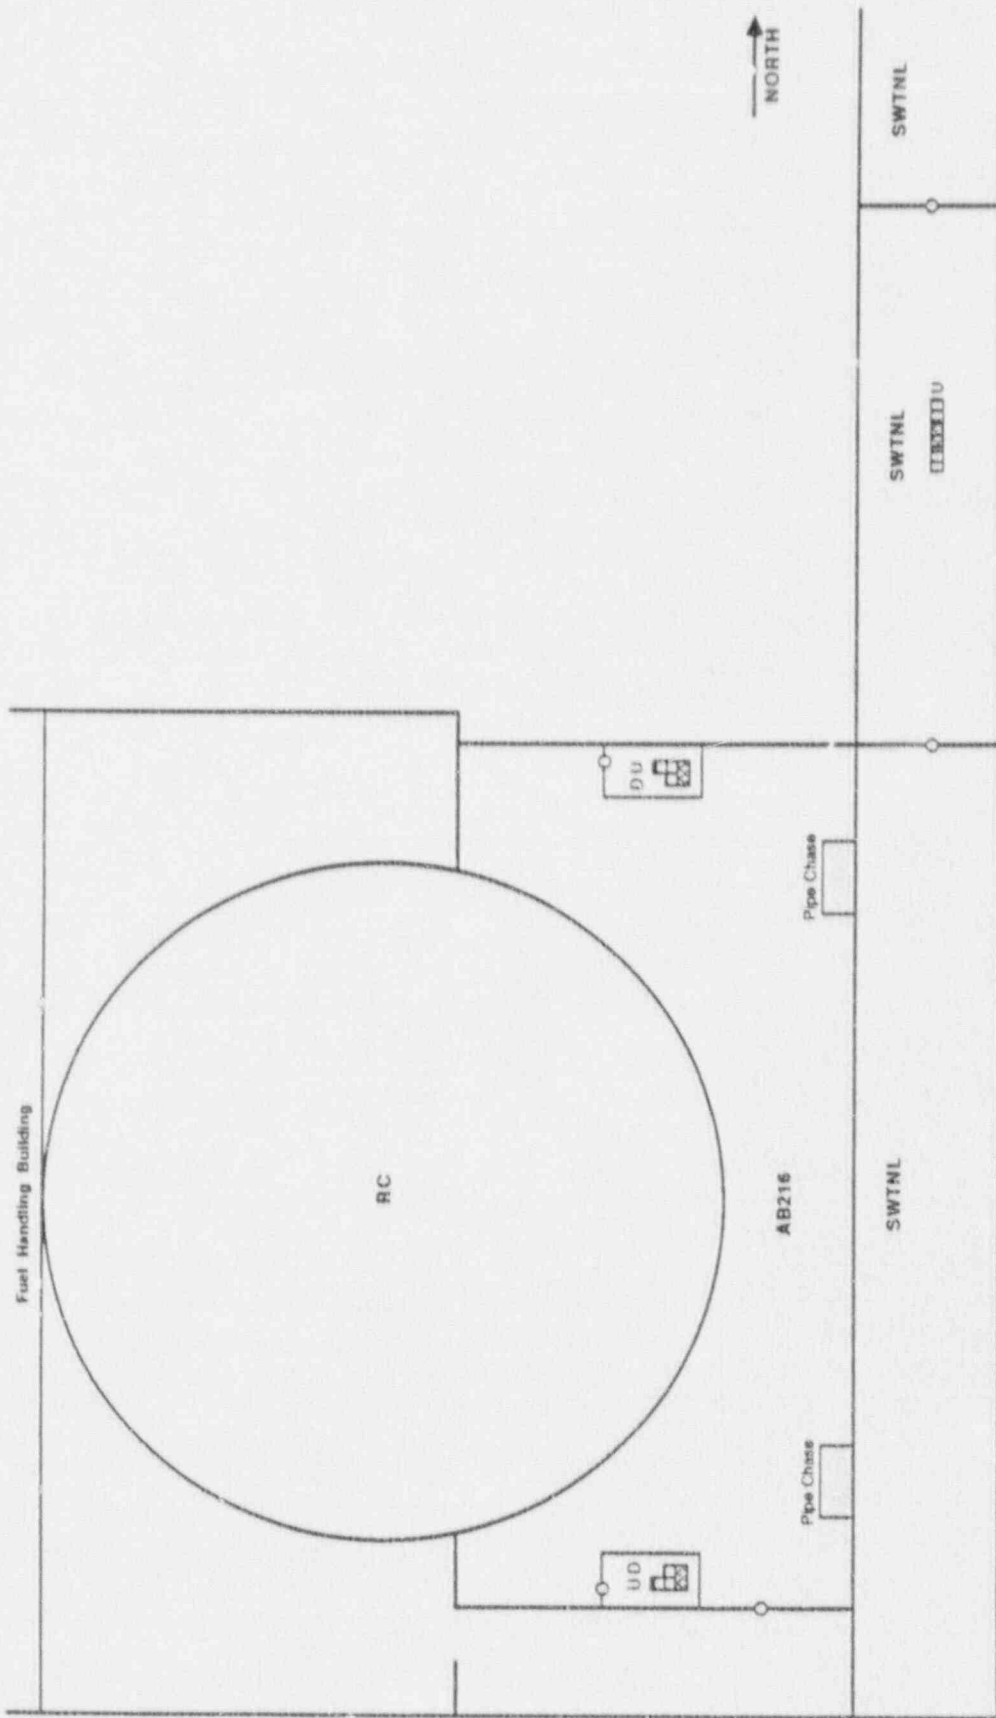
Shearon Harris Reactor Auxiliary Building, Elevation 216'-0"
